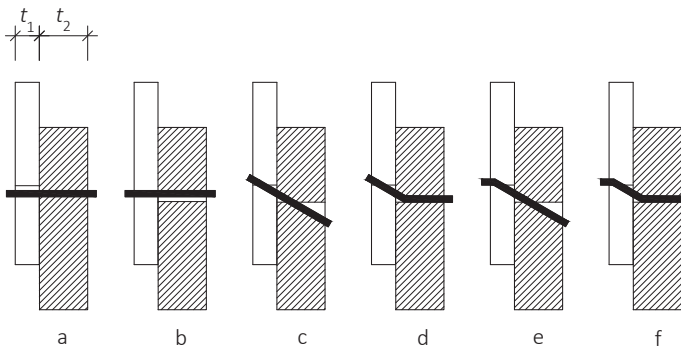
Possible failure modes of timber-to-timber joints with a laterally loaded fastener in single-shear.
